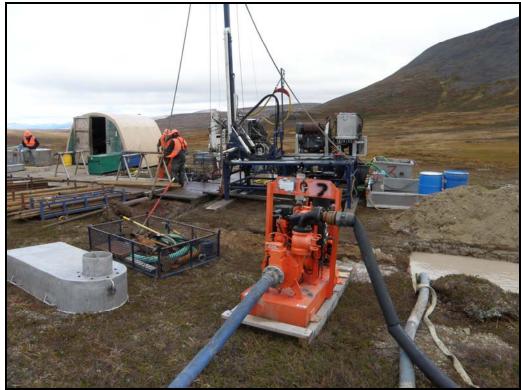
Foundex geotechnical drill rig (GH10-AI). Drill rig is in center of photo, to the right are the blue spill containment barrels. Also visible are sump pump and sump pit (lower right).
